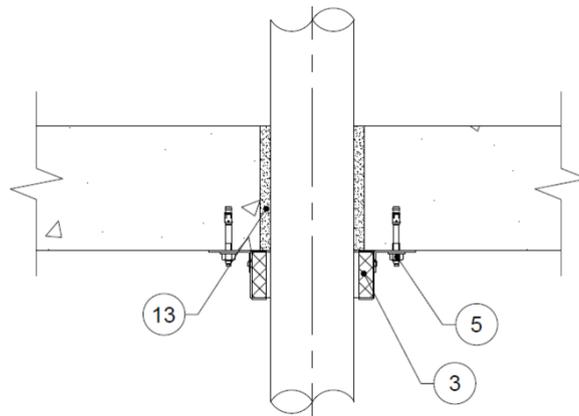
Sealant detail around uninsulated pipes in concrete floors option 2
